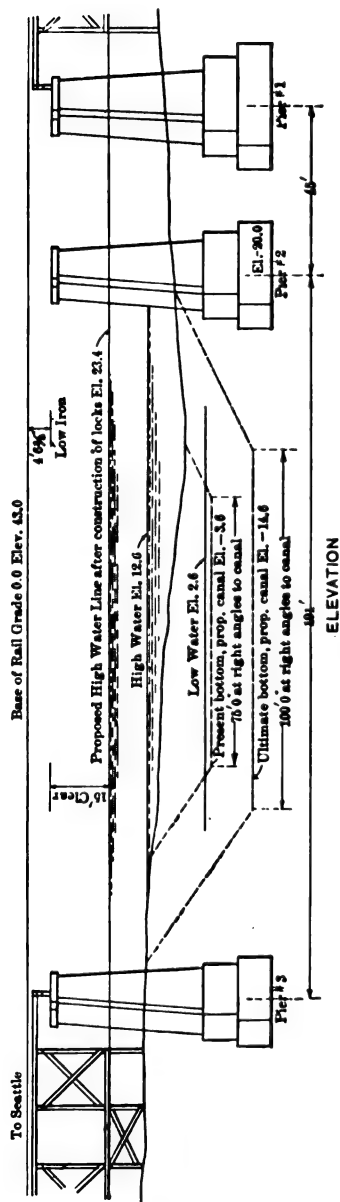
SALMON BAY PIERS, NORTHERN PACIFIC RY.
